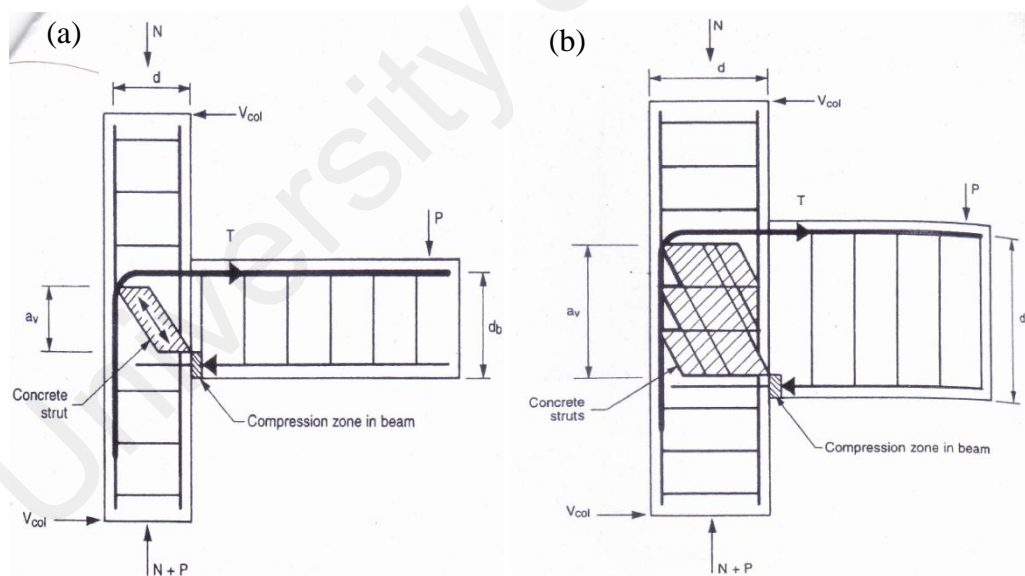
(a) Diagonal concrete strut and beam bars bent down into joint (b) role of links in beam-column joints (Parker & Bullman, 1997)
